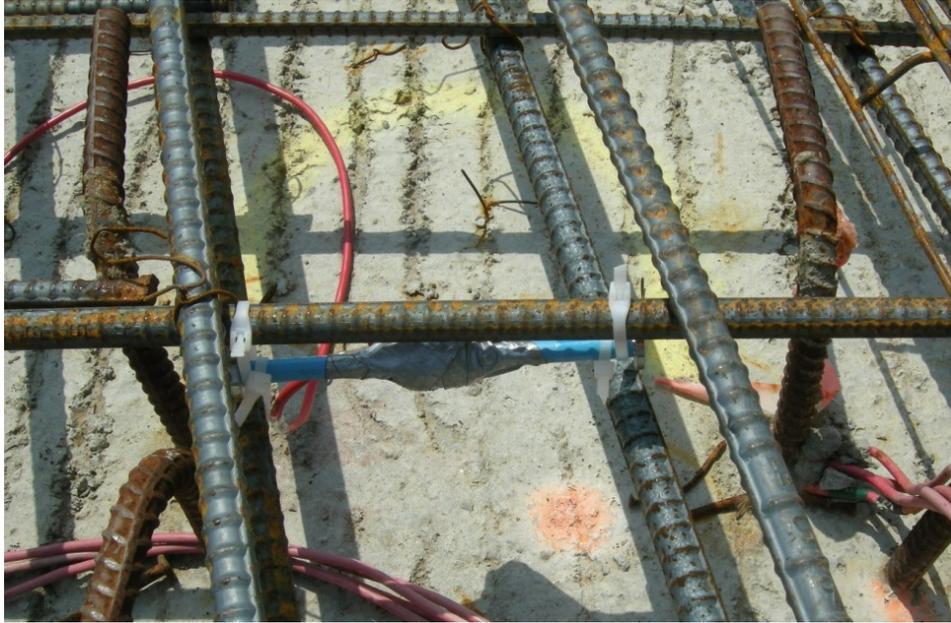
VWSG installed within deck reinforcement prior to casting
